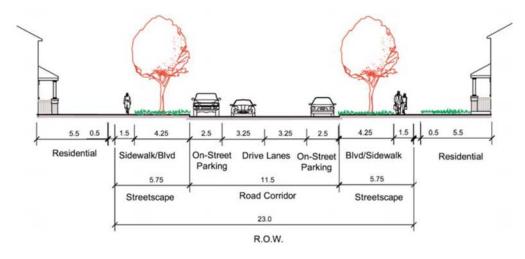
COLLECTOR ROAD, KSP PROPOSED CROSS-SECTION
